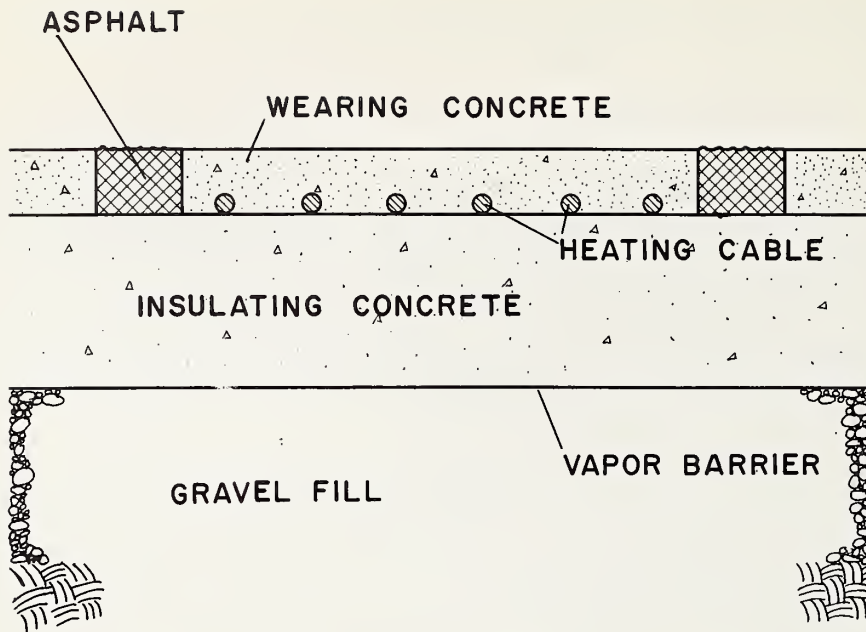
Insulating concrete, 4 inches in thickness, may be used under the heated area only, or under the entire farrowing house floor. A vapor barrier is important below the insulating concrete.
